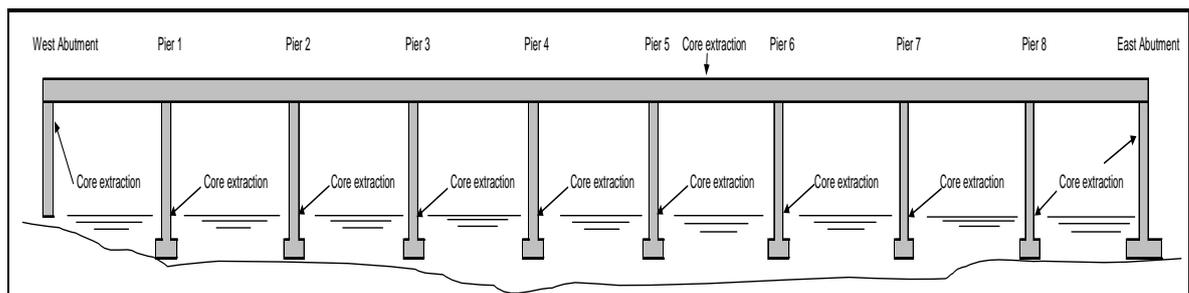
Position of core extractions at Black Mfolozi River Bridge
